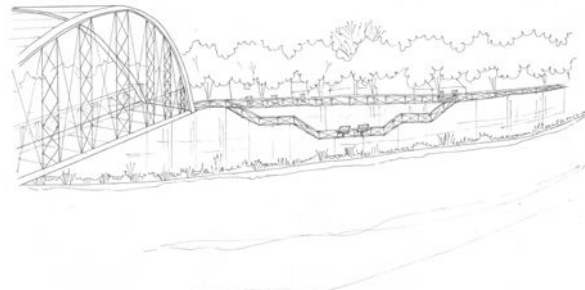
Sketch illustrating possible outlook at Blackfriars bridge.
